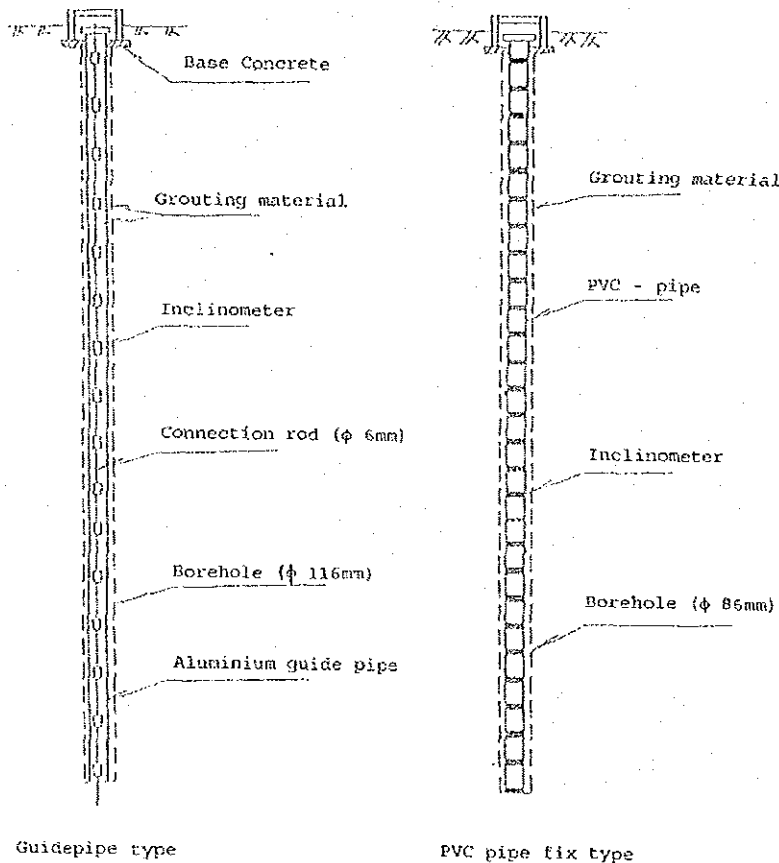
Typical Installation of the In-Place Inclinometer (Ref. *¹⁴ p.148, Fig.2.1.4 (1))
